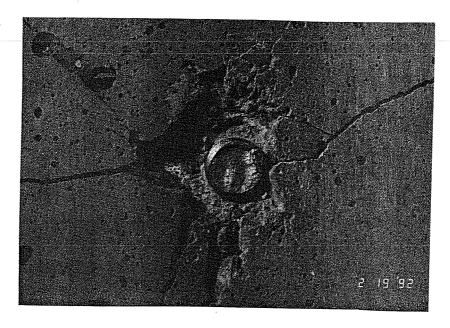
Interface cracking and grout crushing - Test CG3T-SS
